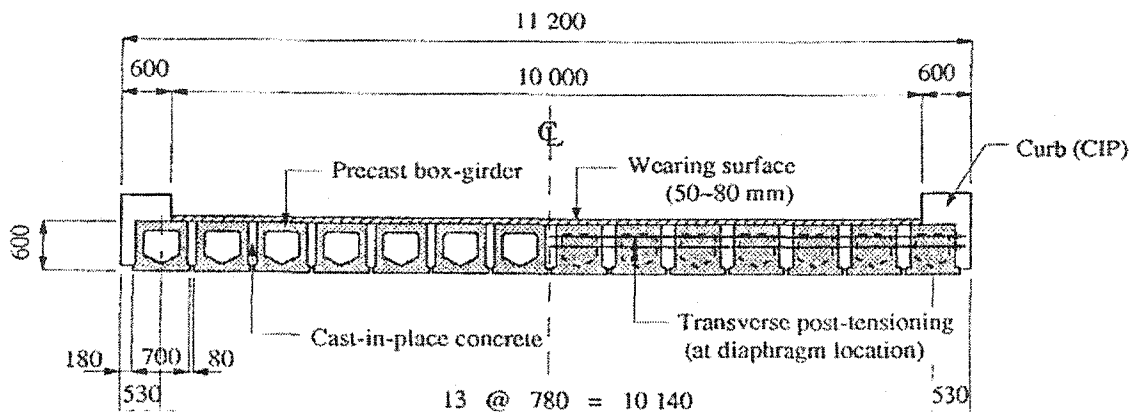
⁷: Cross Section of Box Girder Bridges used for short spans in Japan
